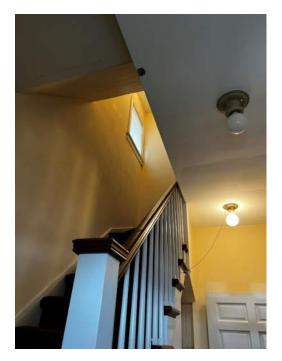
IMG_1239 - East side egress stair. Egress stair is non-compliant with 2020 BCNYS Chapter 10 Means of Egress Sizing: 2'-10" clear width, 2'-5" High handrail height and winder stair treads. Handrails are not continuous without interruption by newel posts and do not extend past the top and bottom risers (2020 BCNYS 1012.4 & 1012.5). Handrails are not present on each side (2020 BCNYS 1009.10).
